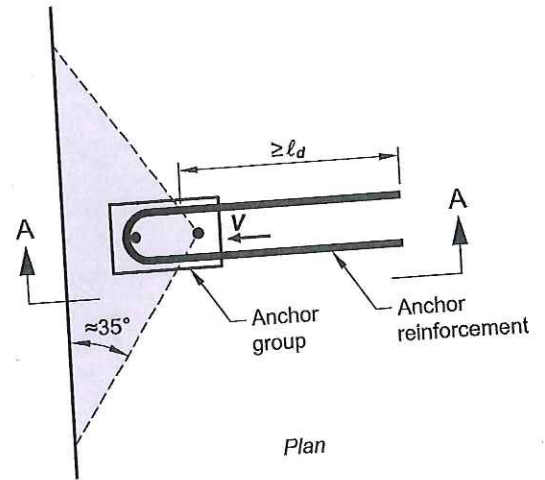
Hairpin anchor reinforcement for shear.
